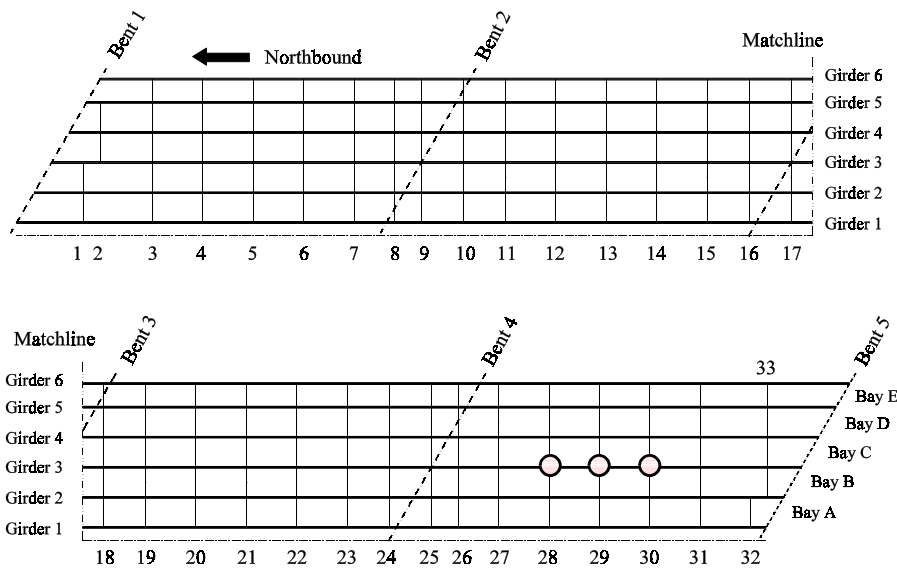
Framing plan with locations of repaired fatigue damage.
